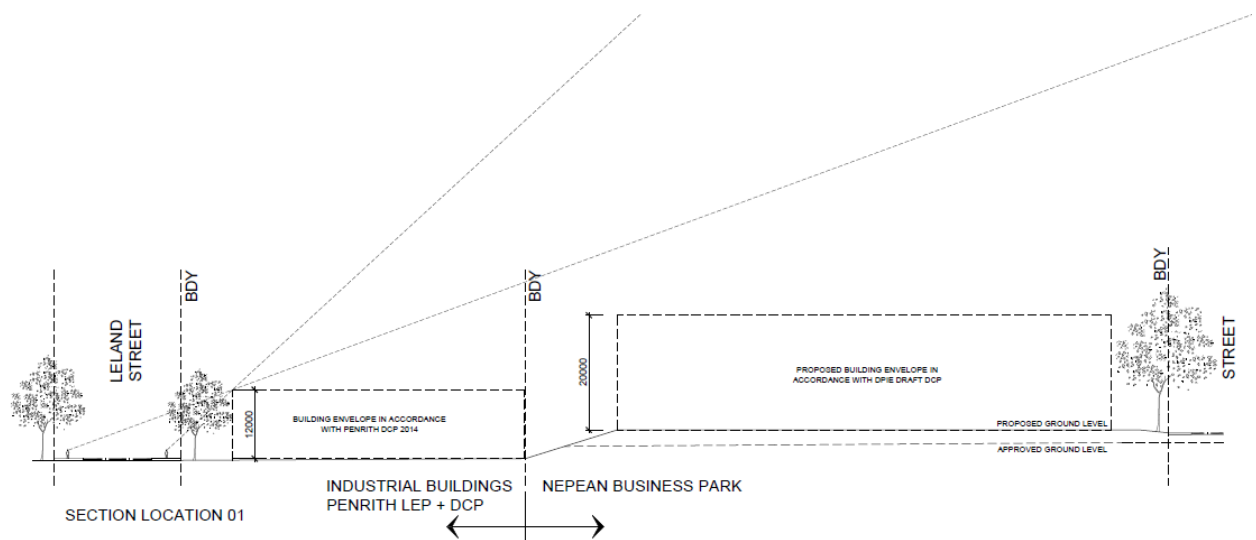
Section (Location 01) showing ground levels and viewlines in relation to adjoining industrial sites on Leland Street (Source: MCHP Architects)
